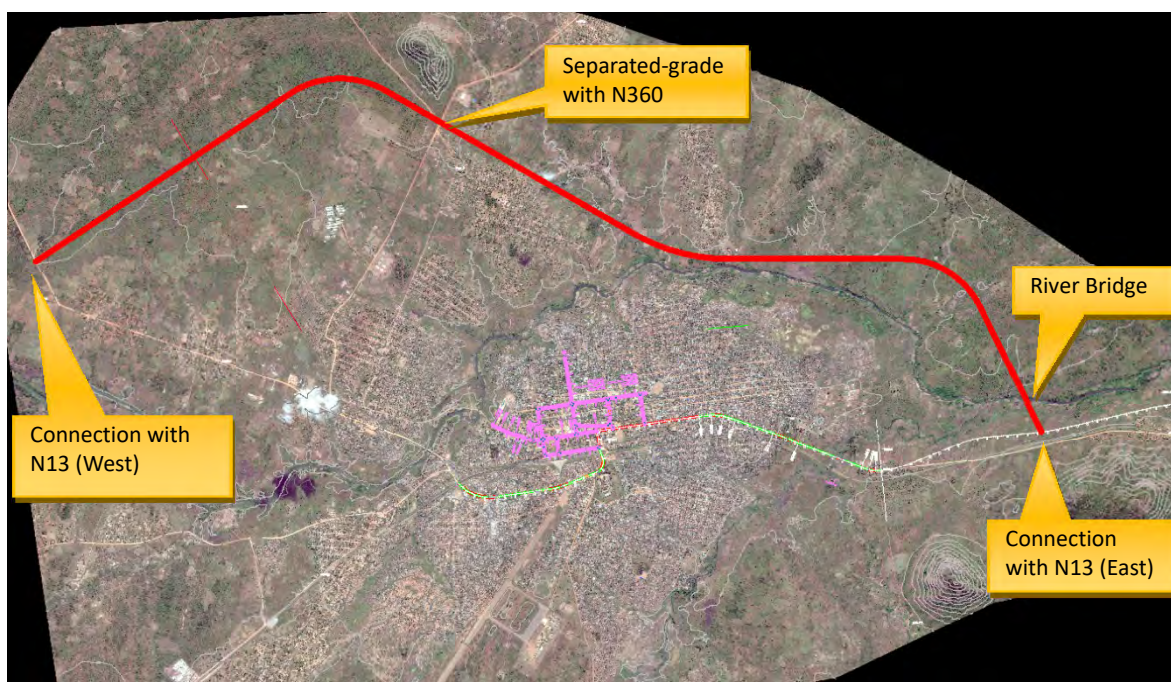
Locations for Structures in the Cuamba Bypass Road
